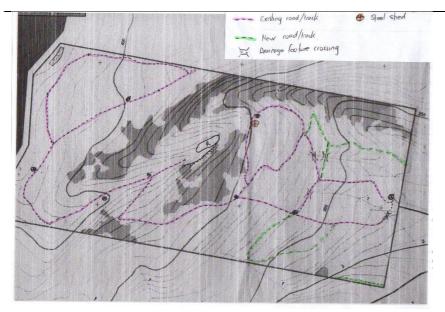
location of existing and proposed access roads/tracks and new shed.
